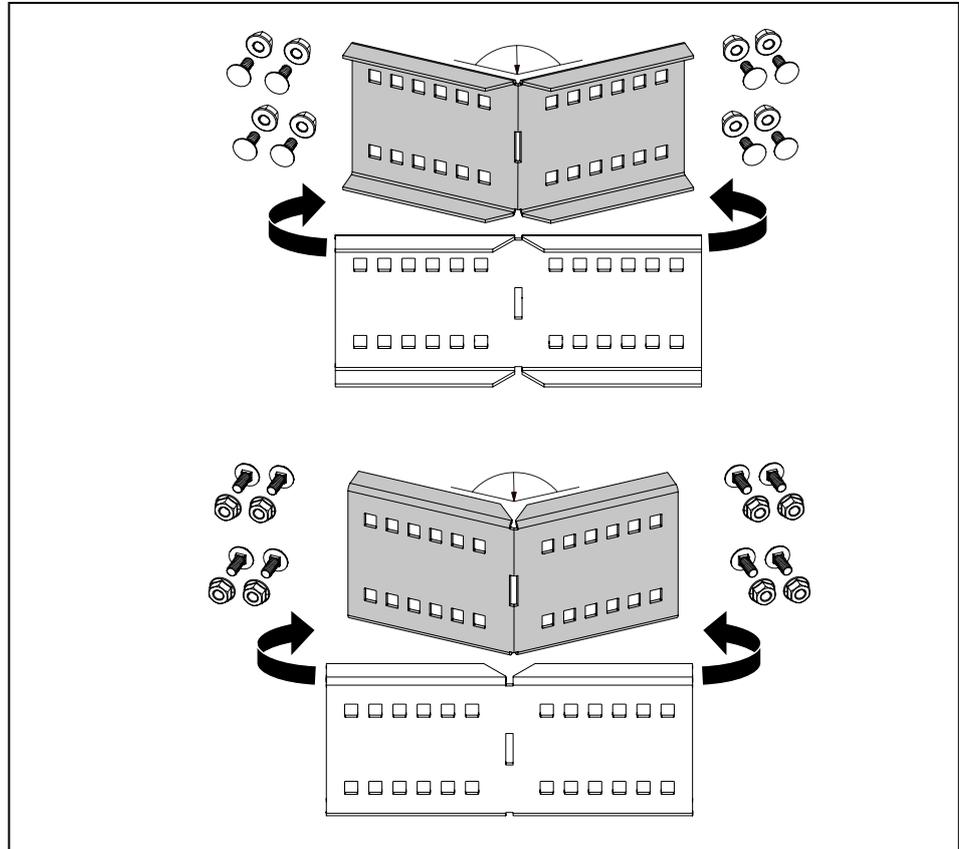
Screwing on the WRWV angle connector to the inner and outer angle
